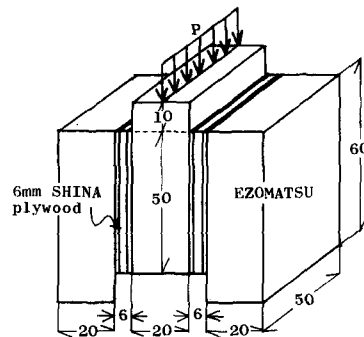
Rolling shear test specimen of veneer laminated wood or plywood. (unit: mm)
